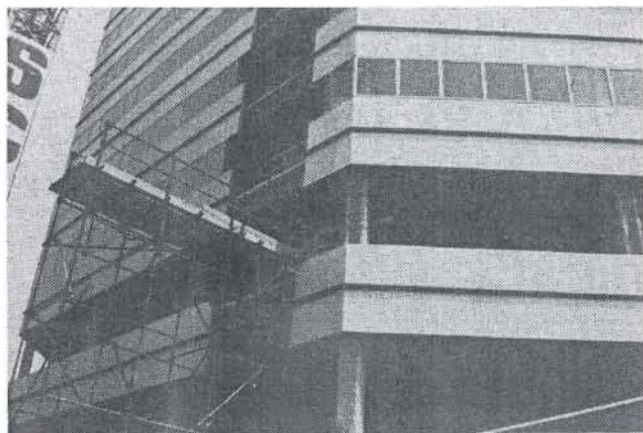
San Benigno North Tower. Detail of cladding mounting.
